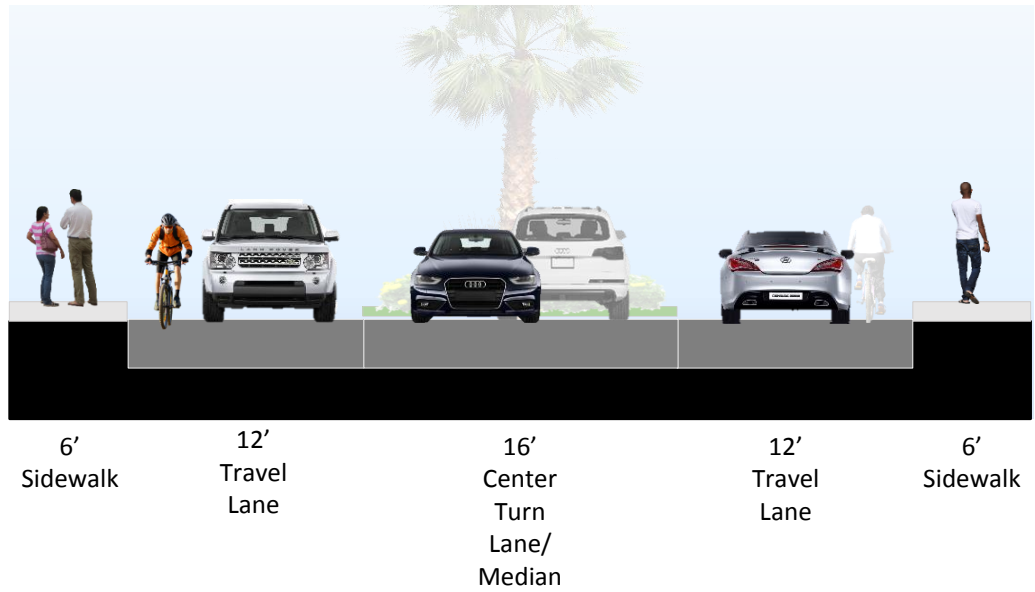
Tampa Street/Highland Avenue Alternative 2 Typical Cross-Section
